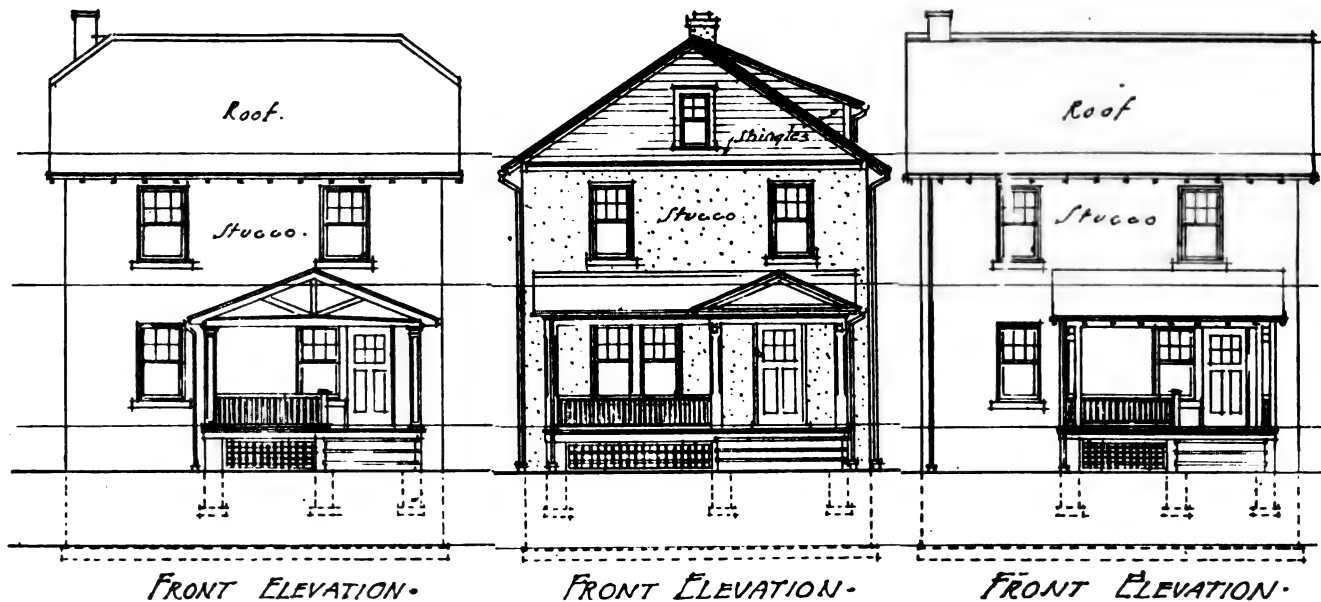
SOME ALTERNATE ELEVATIONS OF CARNEGIE HOUSES
